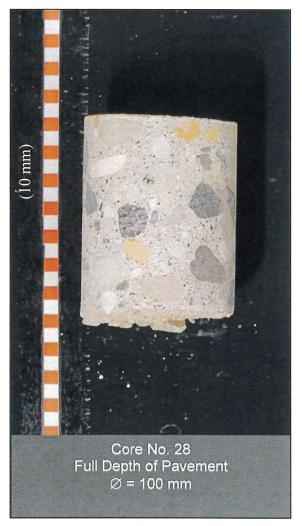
Specimen from Seabrook Cove, Westbound Lane
